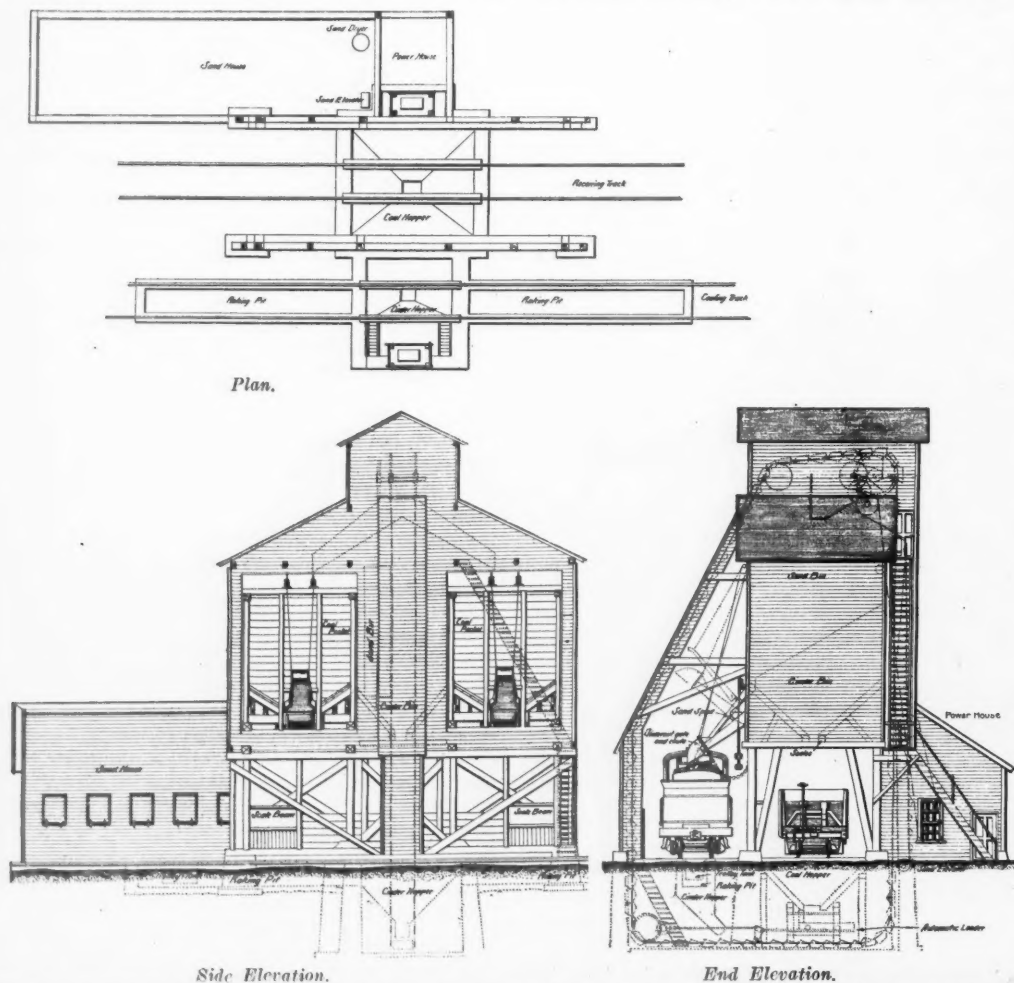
Chicago & Alton Terminal Coaling Stations—Designed and Built by Link-Belt Machinery Co., Chicago.
